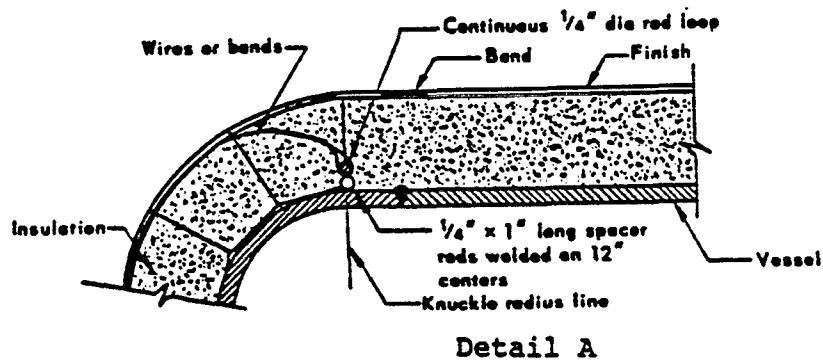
CYLINDRICAL EQUIPMENT - HORIZONTAL
